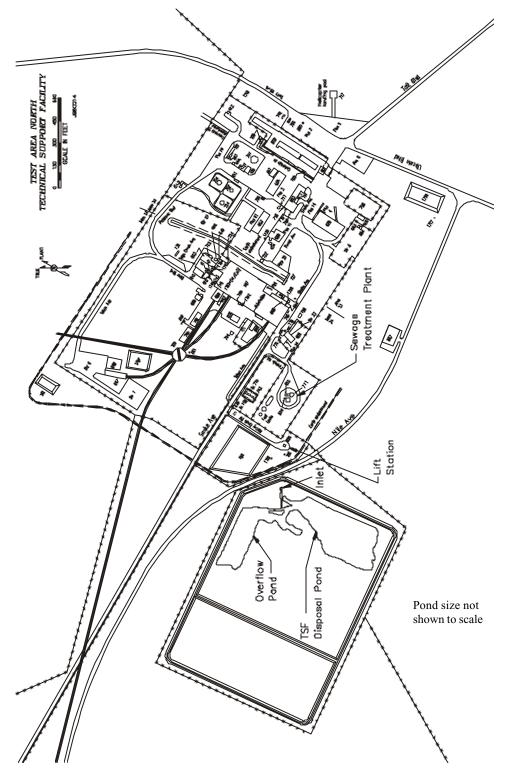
Test Area North/Technical Support Facility Sewage Treatment Plant and Wastewater Disposal Pond.
